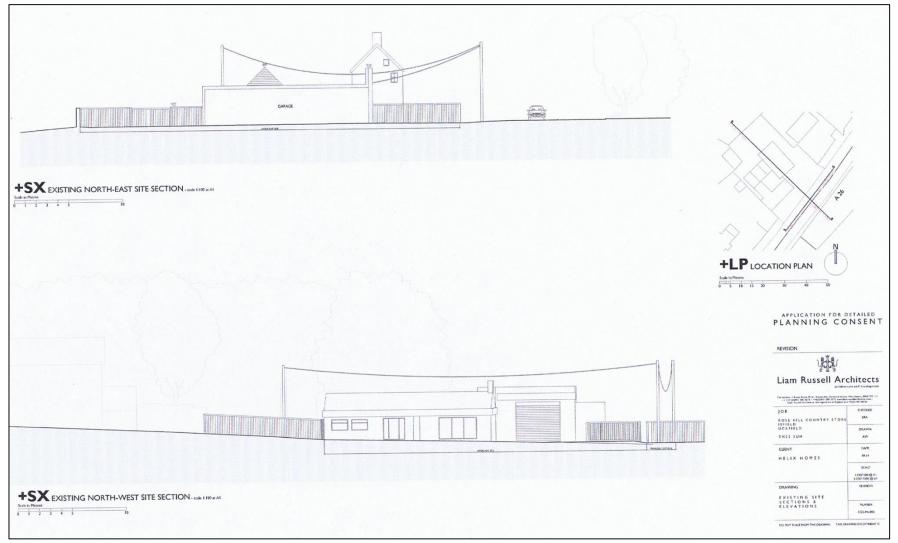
Rosehill Country Store: Existing sections through site prior to demolition (Adapted from architects drawing)
